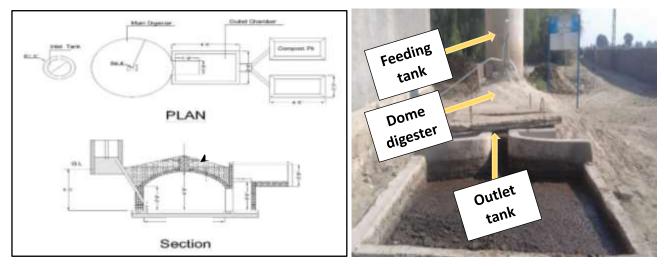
Schematic diagram of concrete dome biogas plant with plan view and section view and Photograph of Dome biogas plant
